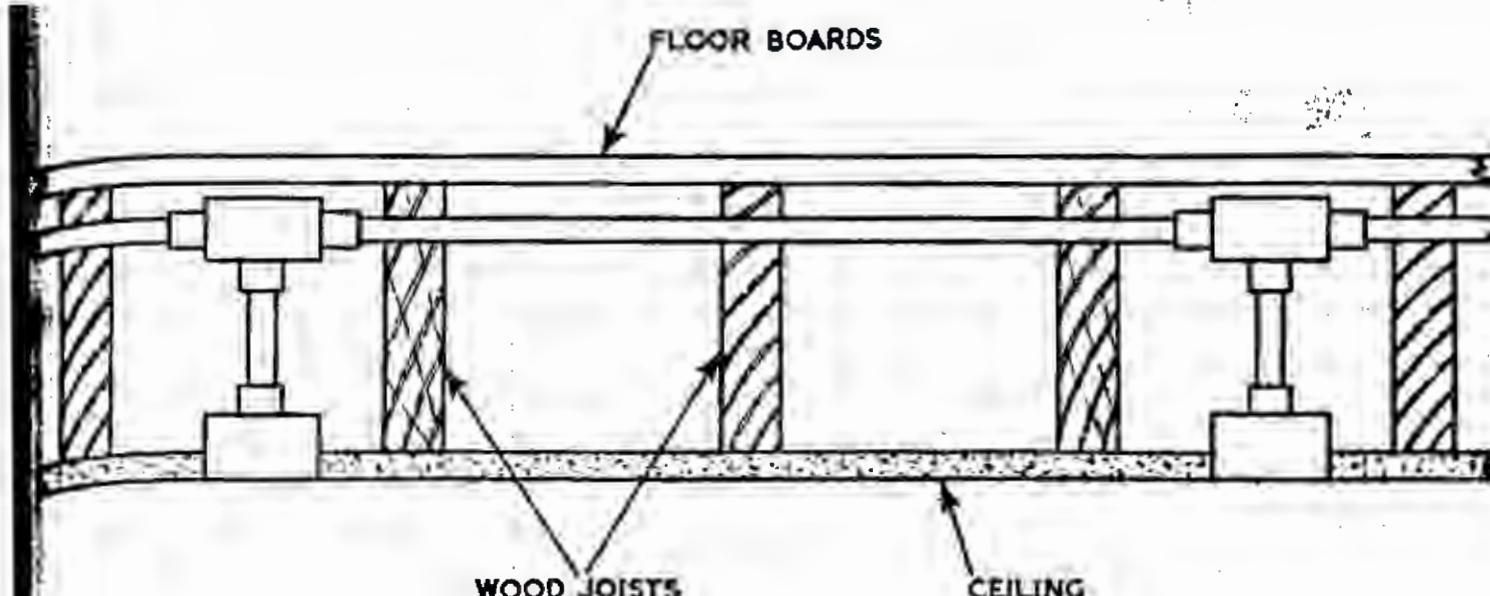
Method of running conduit in wood floors to feed lighting points
